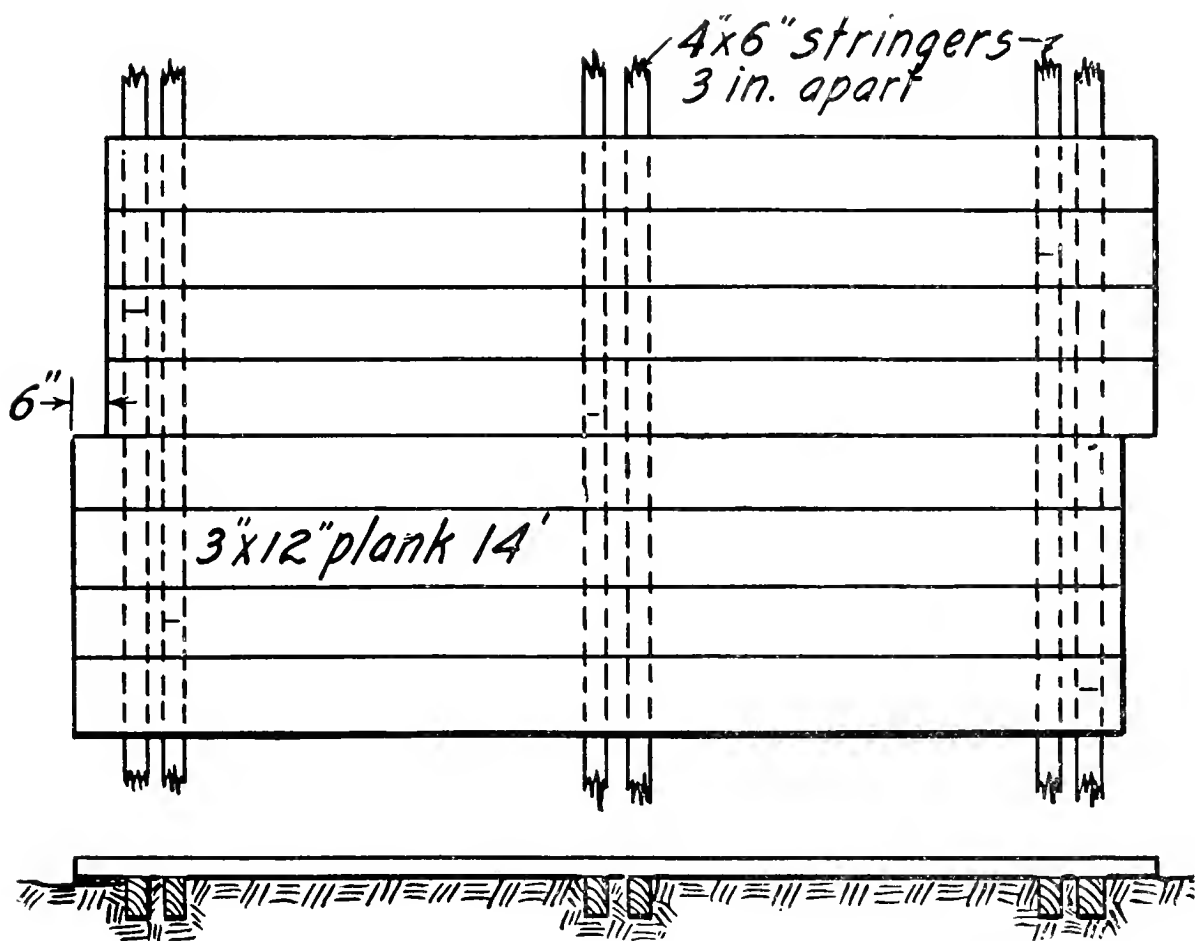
Cross section of a plank road. Note the 6-inch offset of *eve* fourth plank to assist in getting a wheel back on the road.
